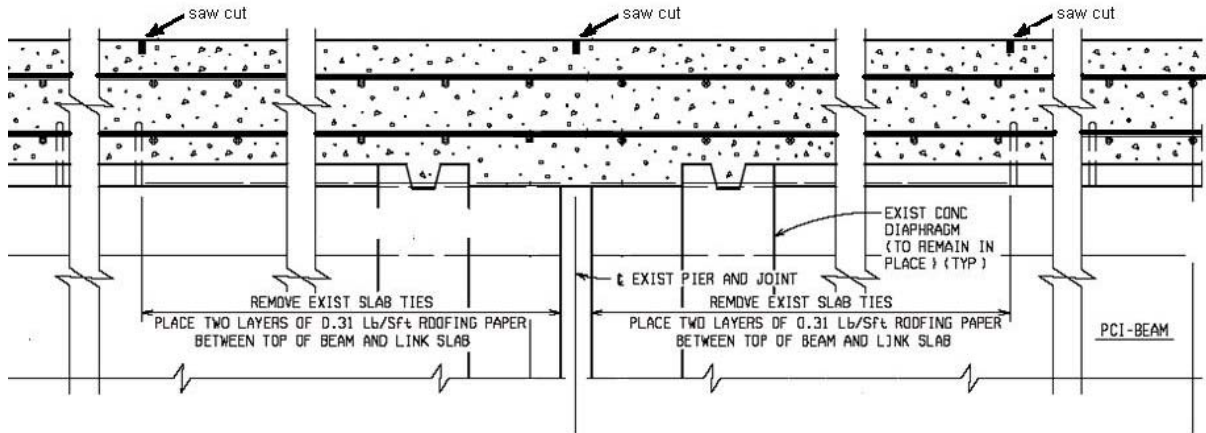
Proposed link slab details; both reinforcement layers are continuous with three saw cuts
